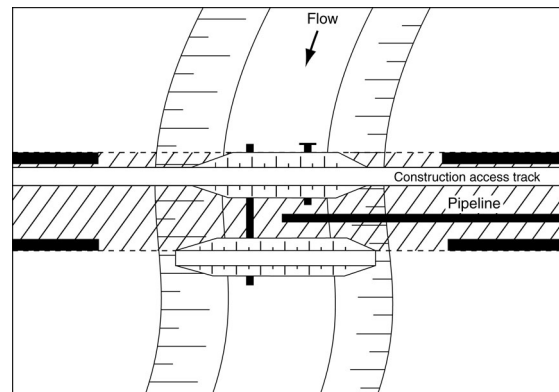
Stage 1 of pipeline installation with one of the bypass pipes taken off-line to allow better access for pipe installation
